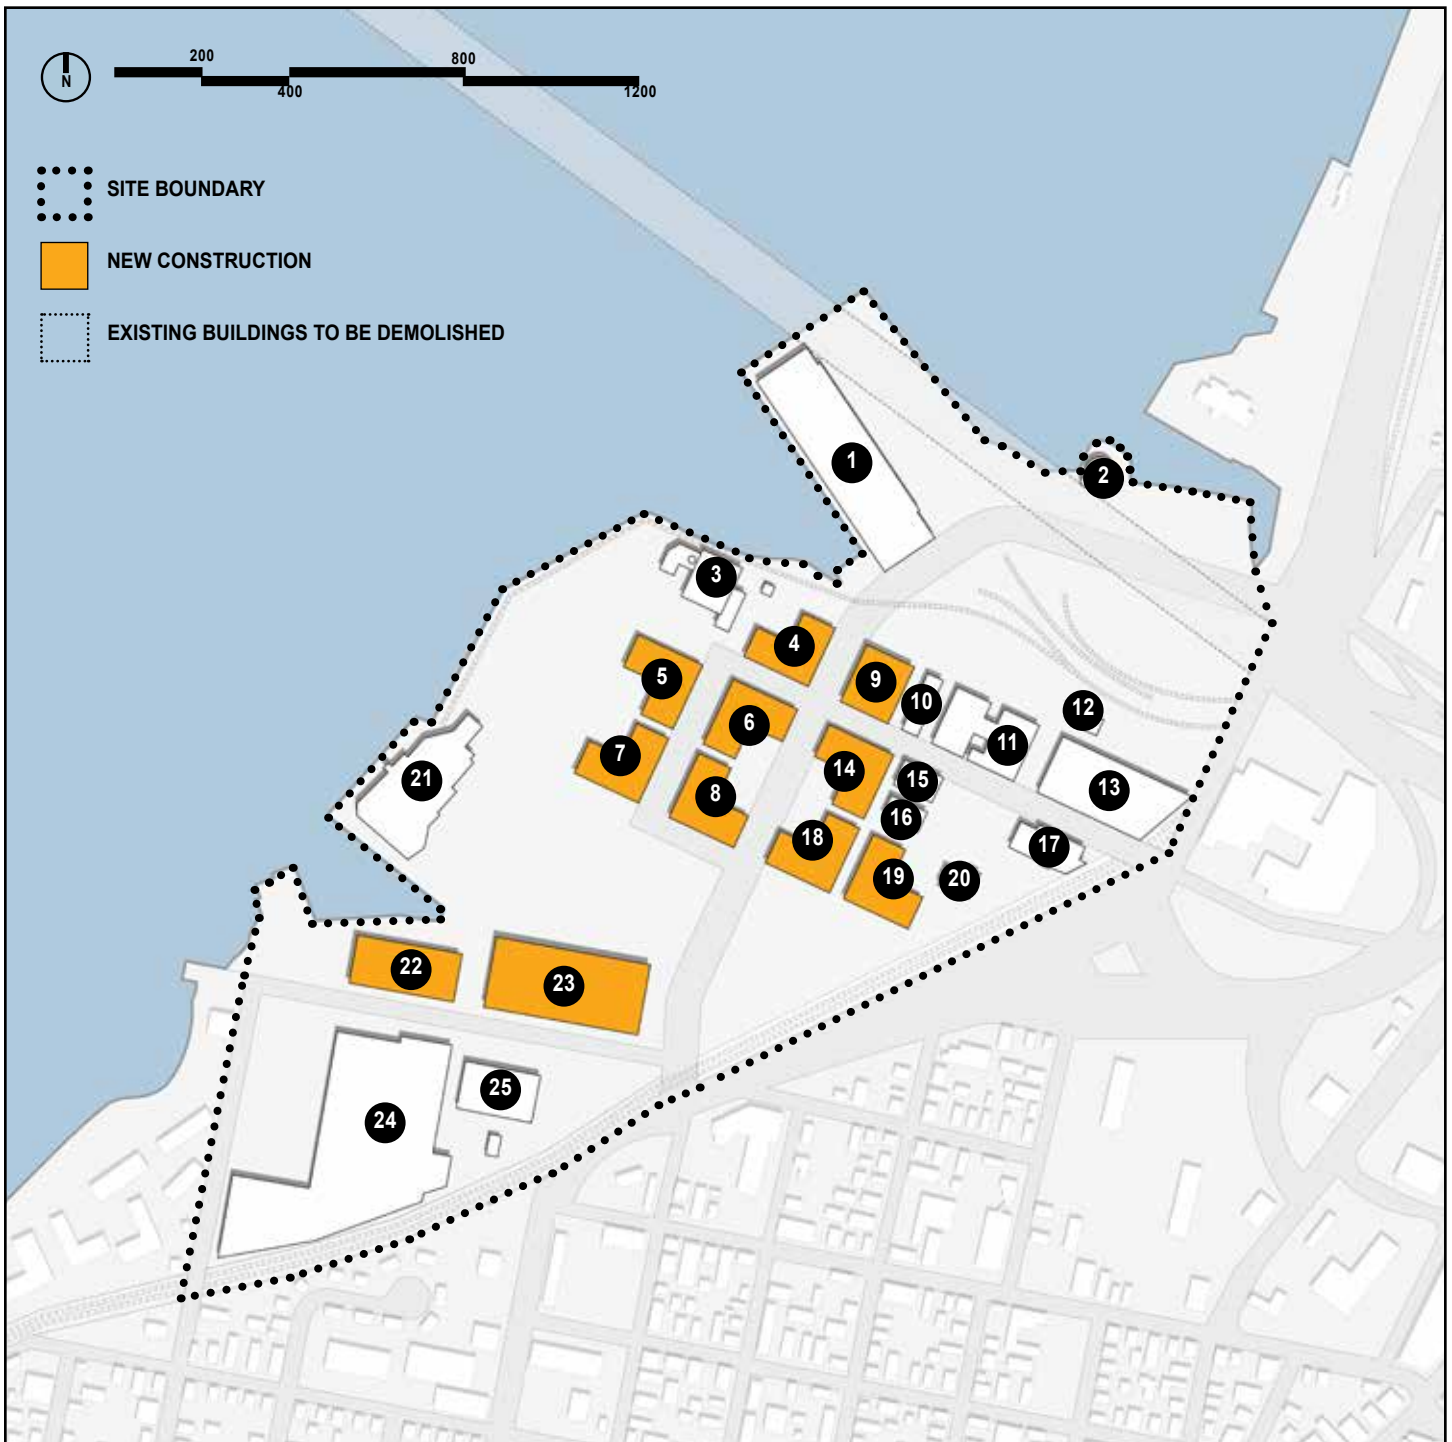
New Construction Map (Source: Morgan Warner)
